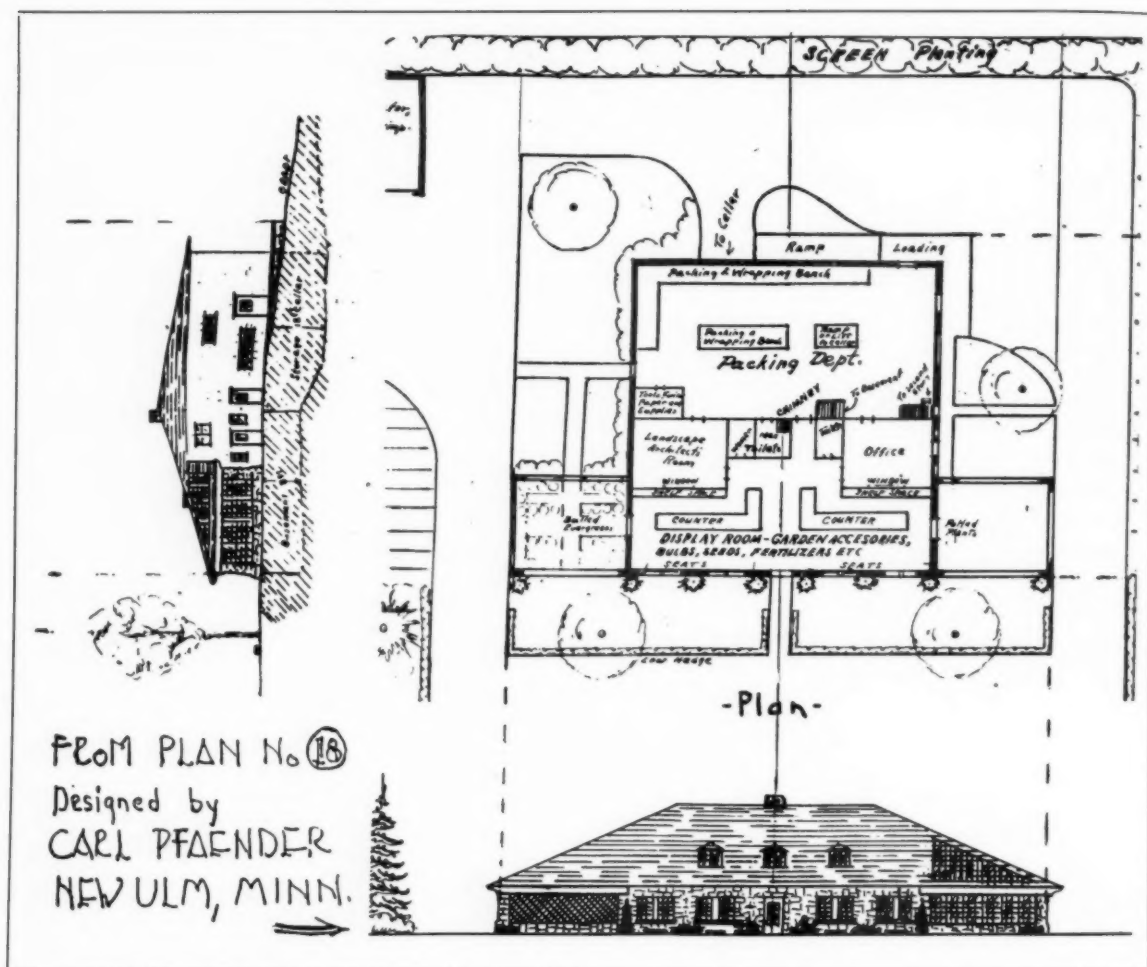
from the plan by Carl Pfaender, New Ulm, Minn., shows an interesting elevation and good treatment for a storage basement.
